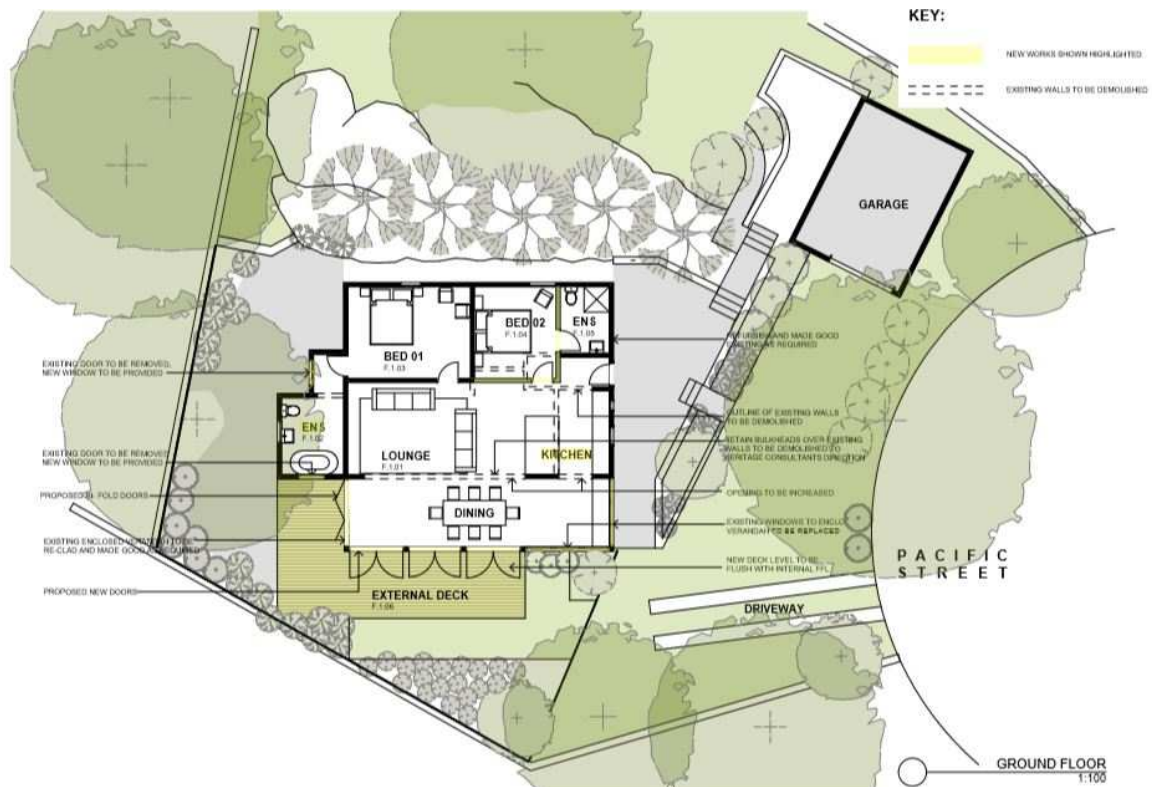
33 Green Point Cottage Proposed Site Plan
